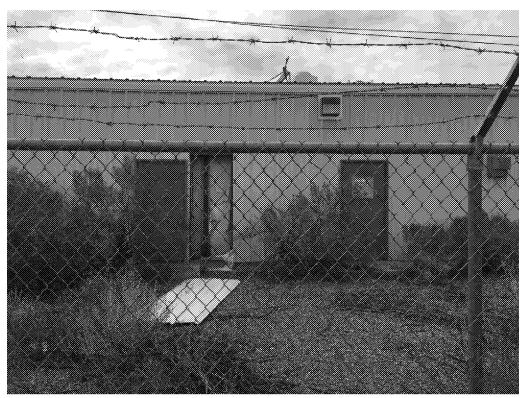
OU-4, SS024 – Damaged wall panel on east side of Building 1010
